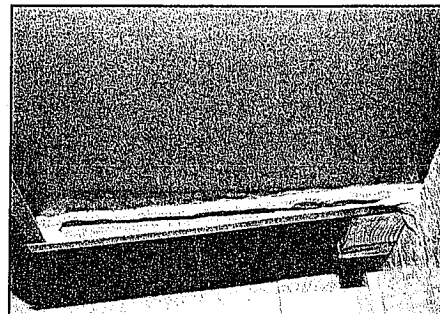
Caulk seal outside joints of wall sleeve before inserting into wall opening. (Underside view of wall sleeve bottom.)
